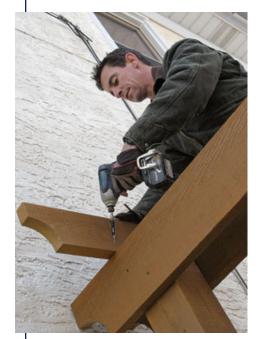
Rafters were toe-screwed to the girder with deck screws.
